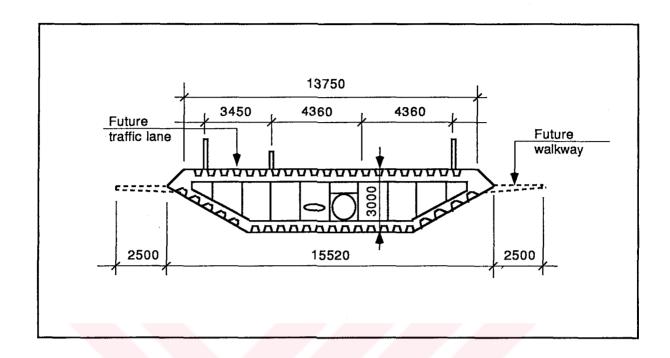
CROSS-SECTION, MAIN SPAN (In mm)
